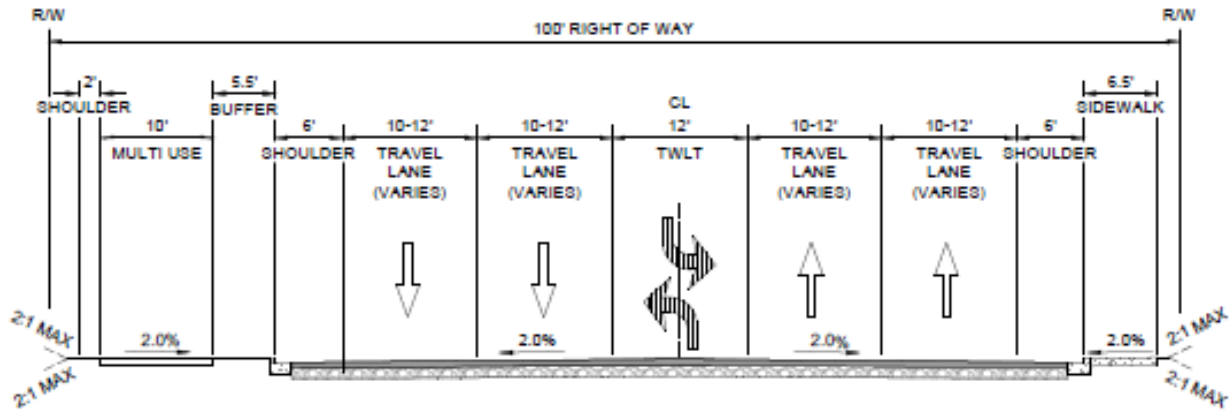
Roadway Design Standard Principal Arterial with Multi Use Trail
